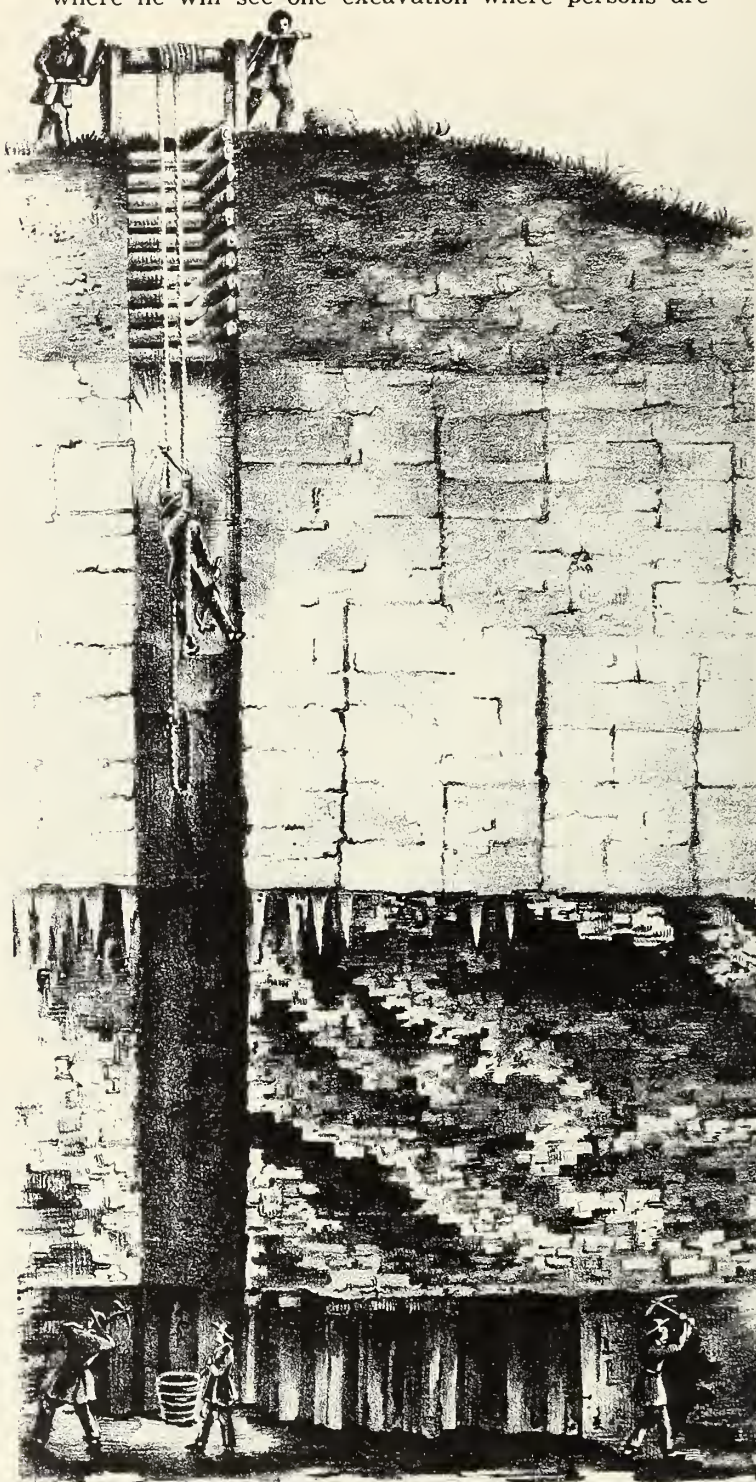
10 Cross Section of a Mine Shaft and Underground Workings Showing Rope Used for Descent and Ascent, Windlass, and Timbering in Loose Ground. (From David Dale Owen.)
